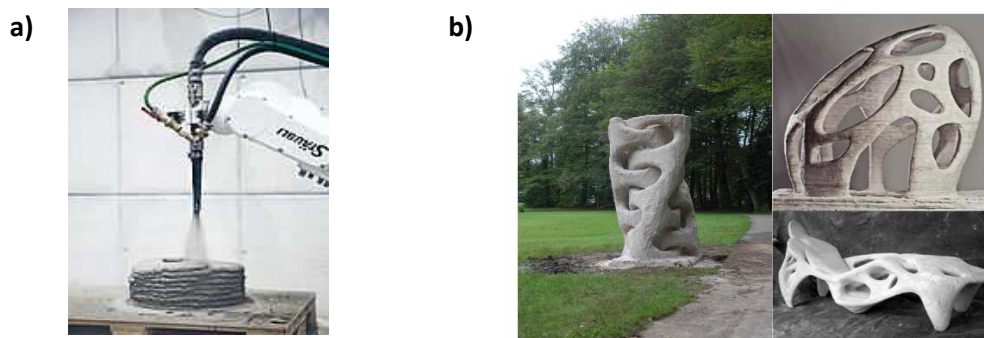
a) 3D printing technology with concrete spraying (SC3DP) - example of a concrete column [8], b) D-Shape technology - example of concrete sculptures. [9]
